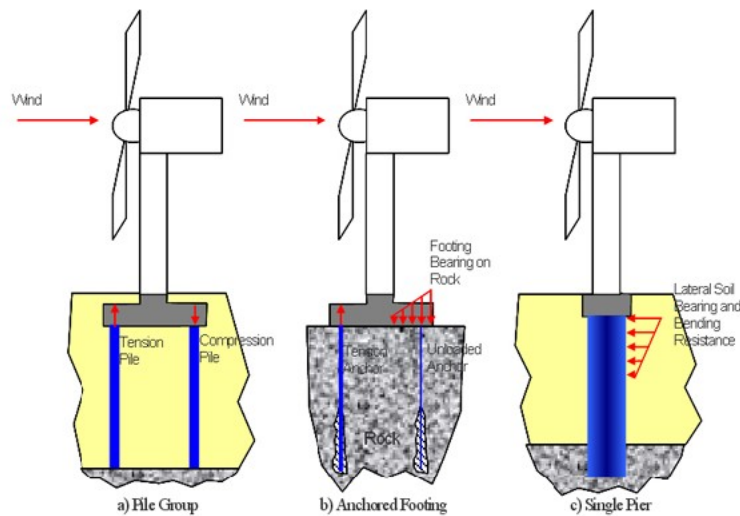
Different foundations, a) spread footing supported by piles, b) spread footing anchored to the bedrock, c) Footing supported by a single, from [4].
